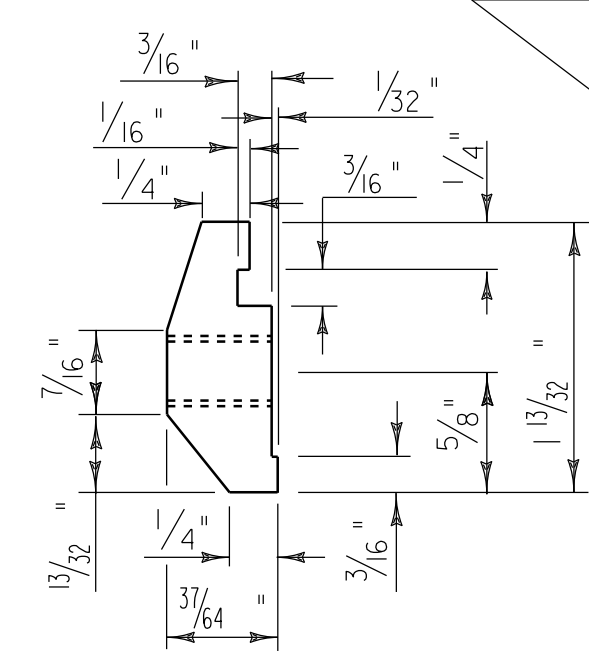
DETAILS OF SPINDLES FOR ALUMINUM RAILING
